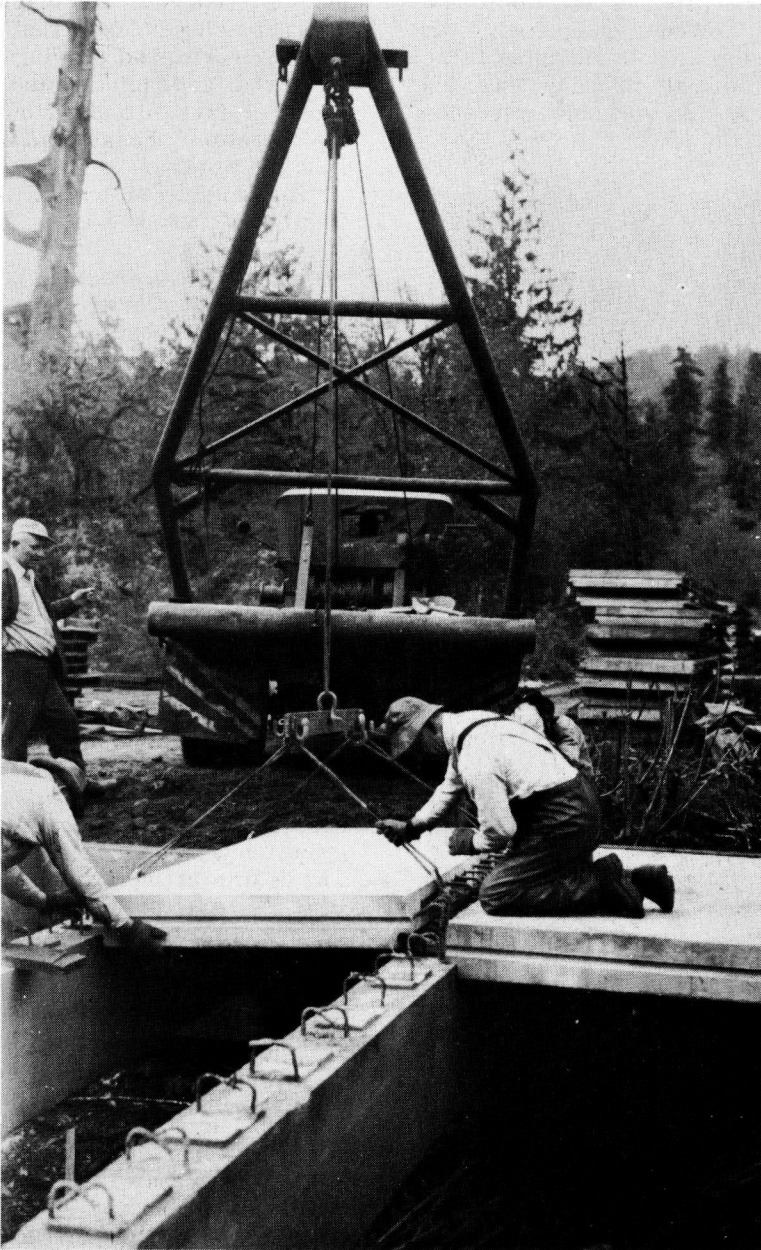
Baker River Bridge - Placing Precast Slab Panels
